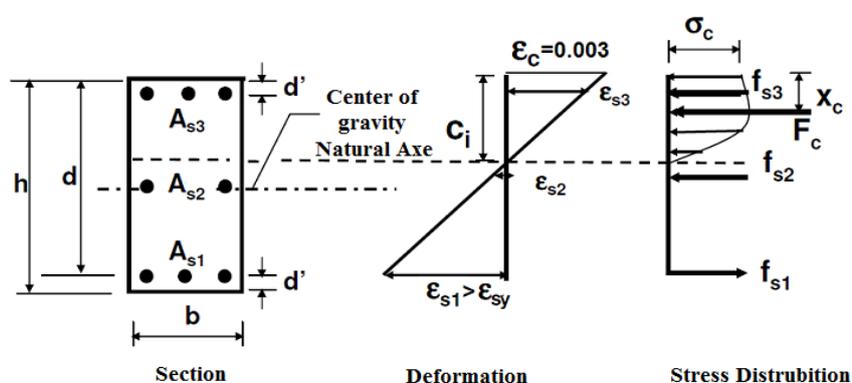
Stress distribution in a reinforced concrete section under bending moment
